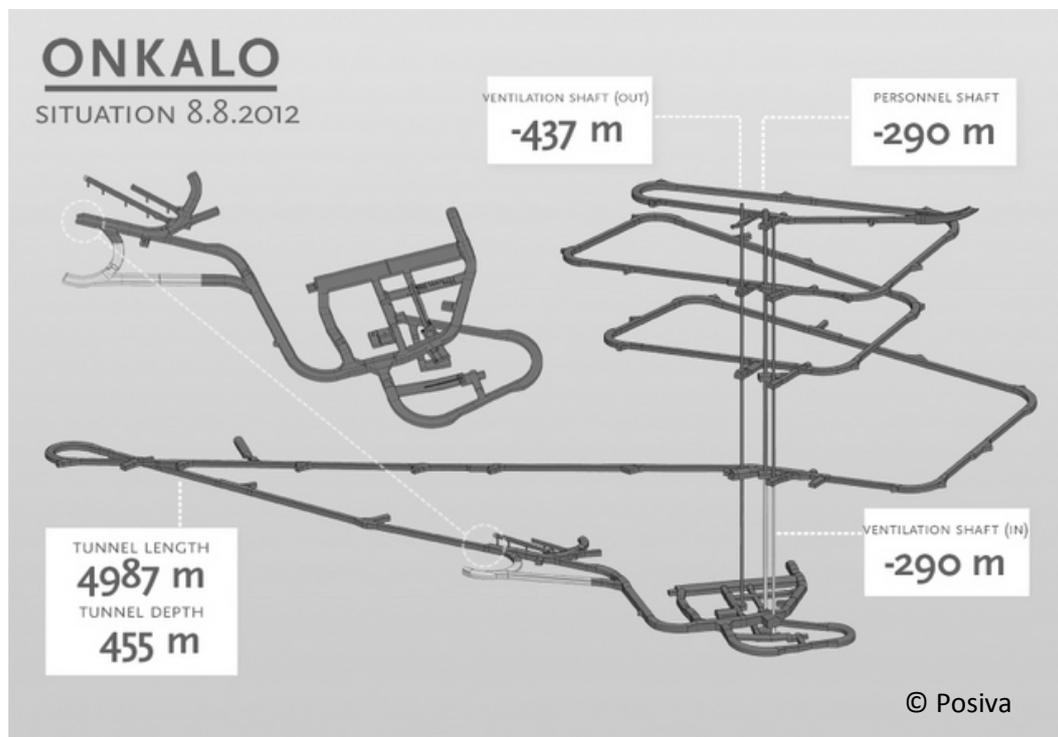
Construction situation on Underground rock characterization facility ONKALO. Access tunnel length 4987 m (www.posiva.fi).
